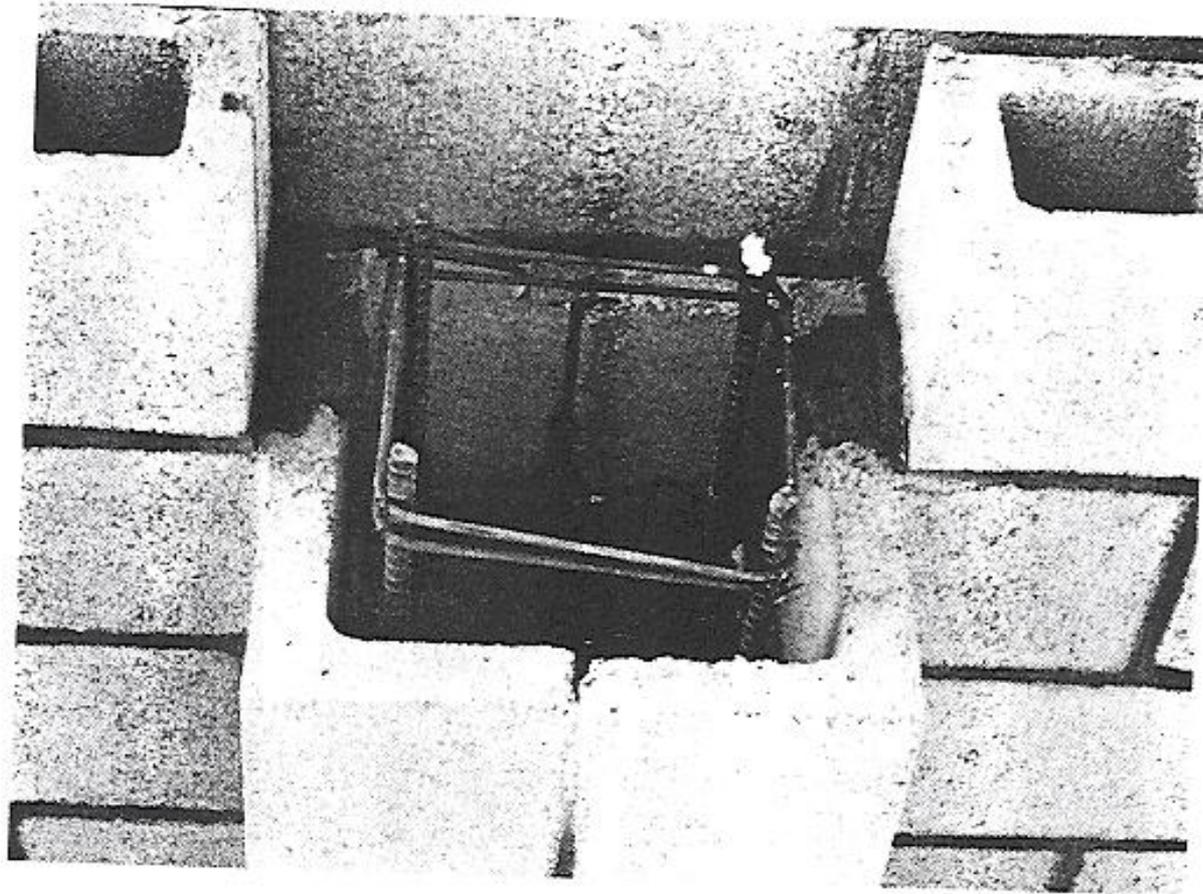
In this pilaster, a set of four reinforcing bars is connected with ties held in place with soft iron wire.
